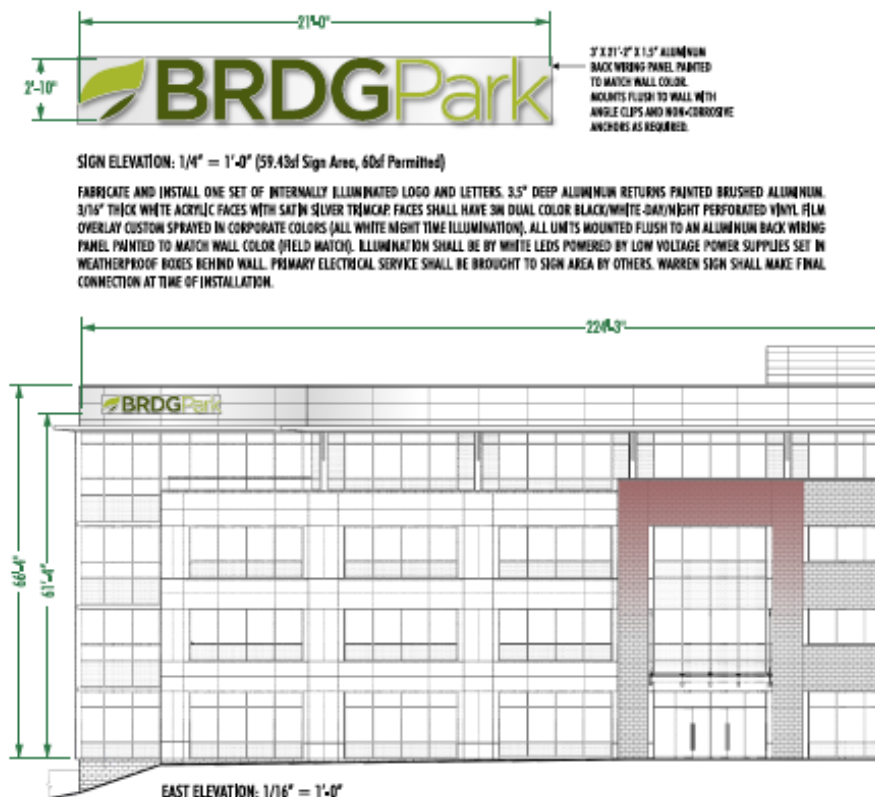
Proposed 60 sq. ft. sign for the existing BRDGPark building
